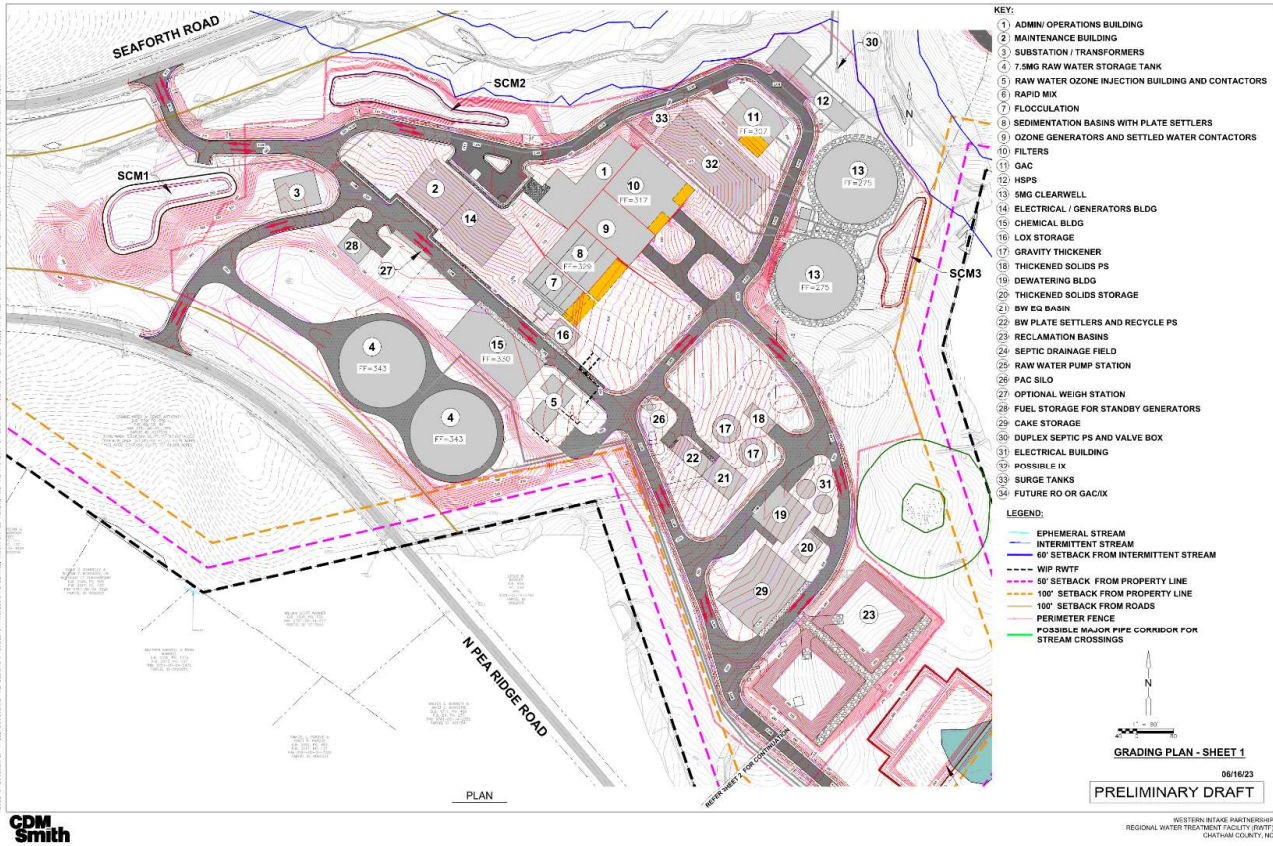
| Grading Plan for RWTF – Sheet 1 of 2
